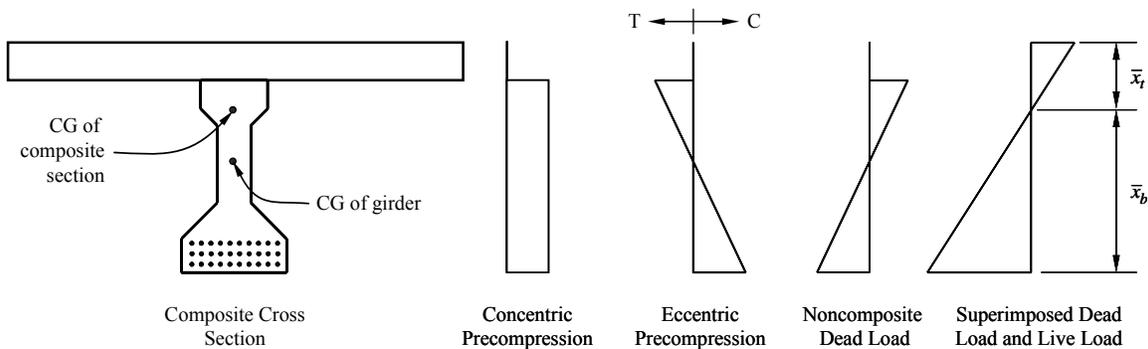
Assumed Distribution of Strains in Prestressed Concrete Bridge Girder
